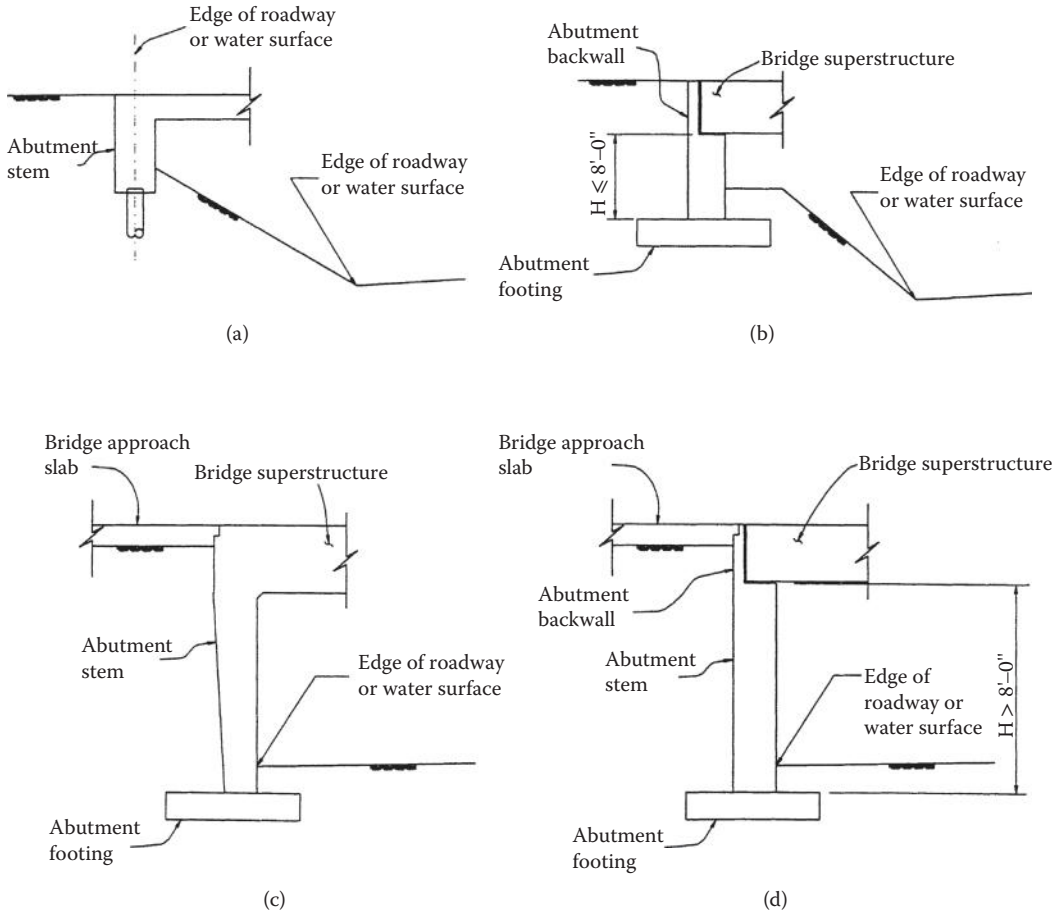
Typical abutment types. (a) Open end, monolithic type, (b) Open end short stem type, (c) Closed end, monolithic type, (d) Closed end, short stem type.
